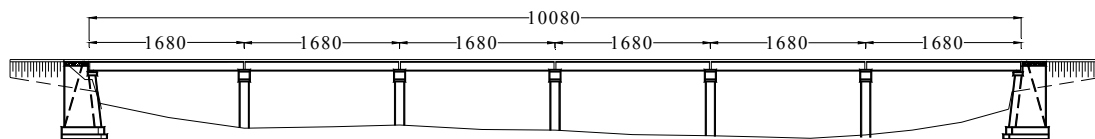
General arrangement diagram of Yingjing Bridge (unit: cm)
